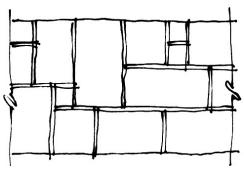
Plan view of a sidewalk laid in cut stone pavers of various sizes.
